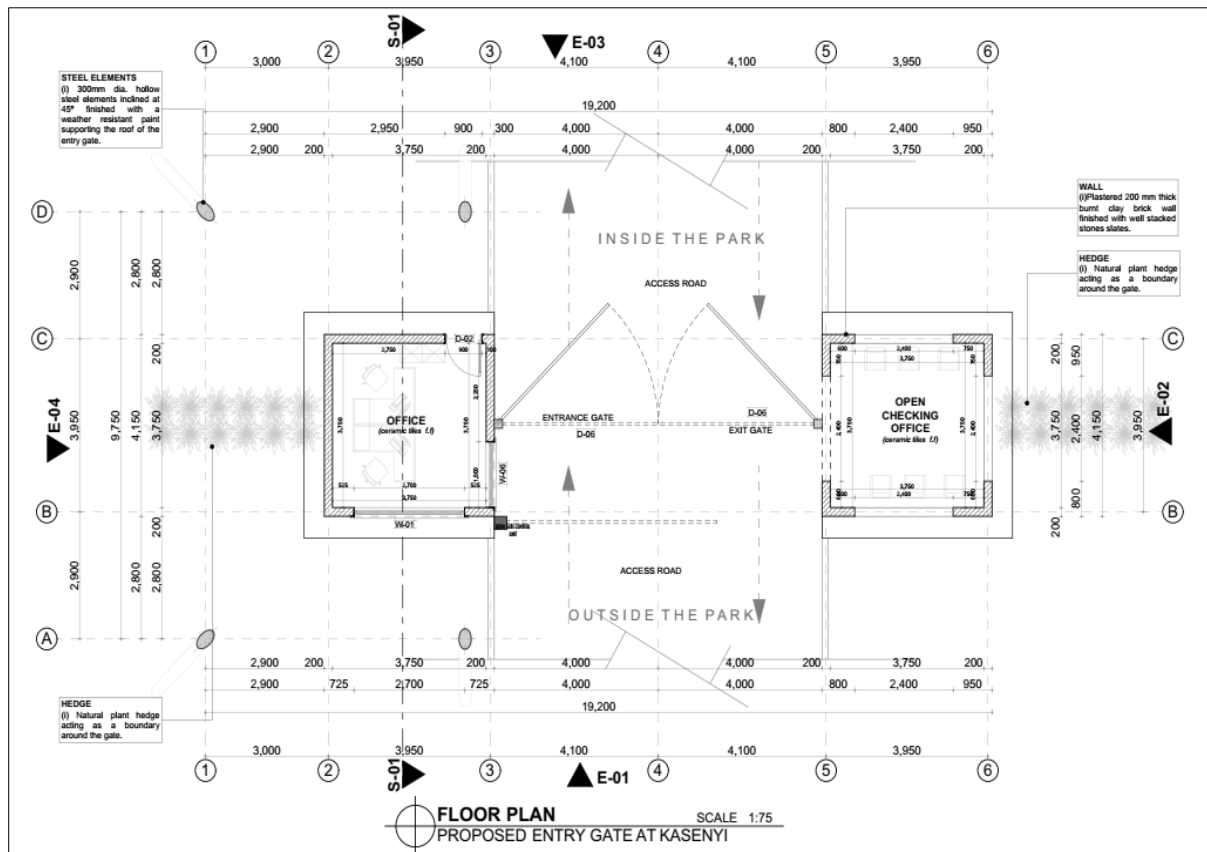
Queen Elizabeth National Park Kasenyi Gate Floor Plan
